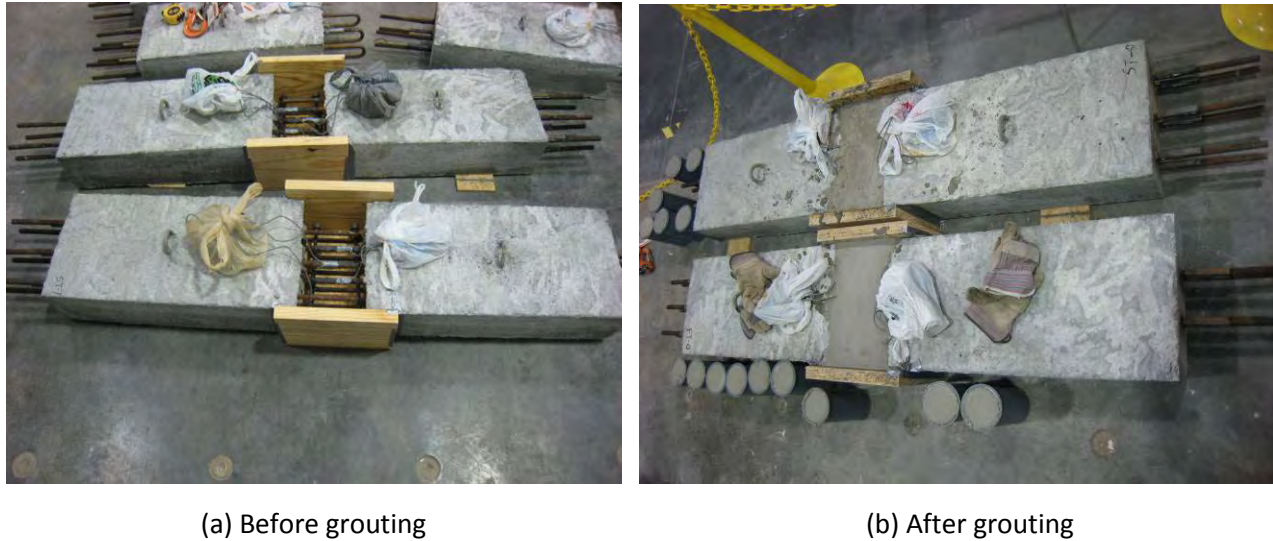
Transverse joint (tension) specimen before and after grouting
